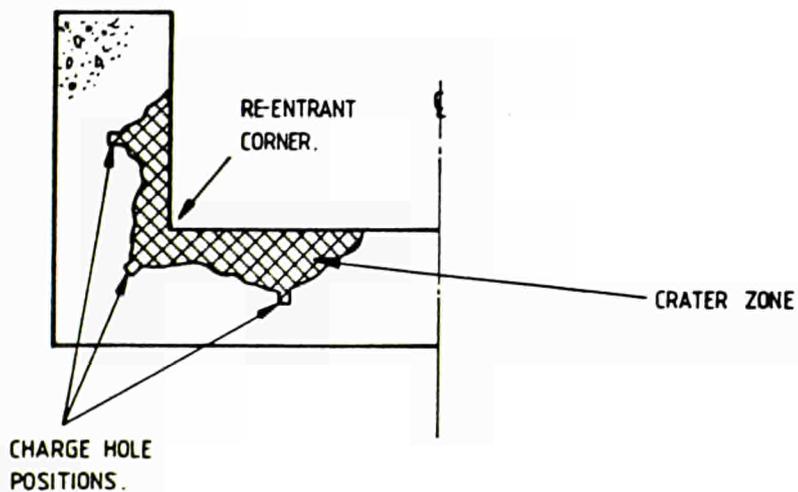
Section showing removal of concrete from a re-entrant corner.
